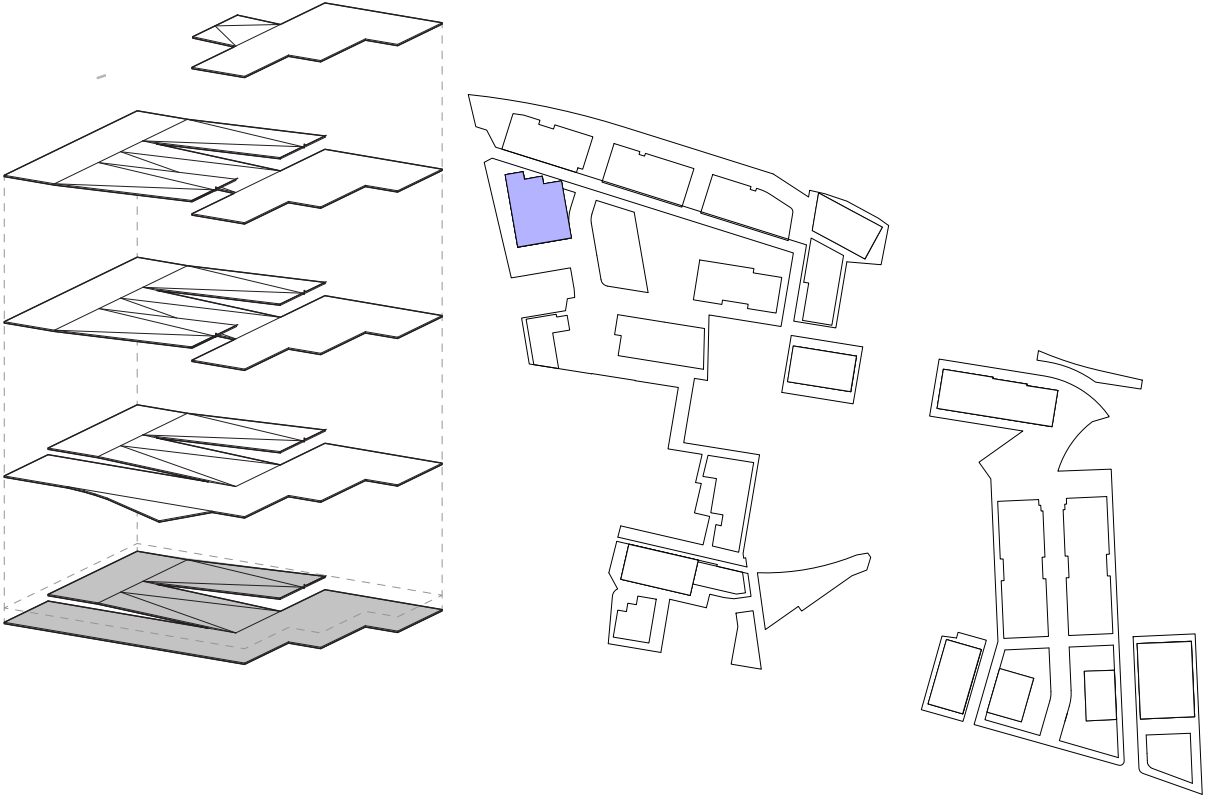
Proposed Vehicle Parking Plans - P1 Level 1
